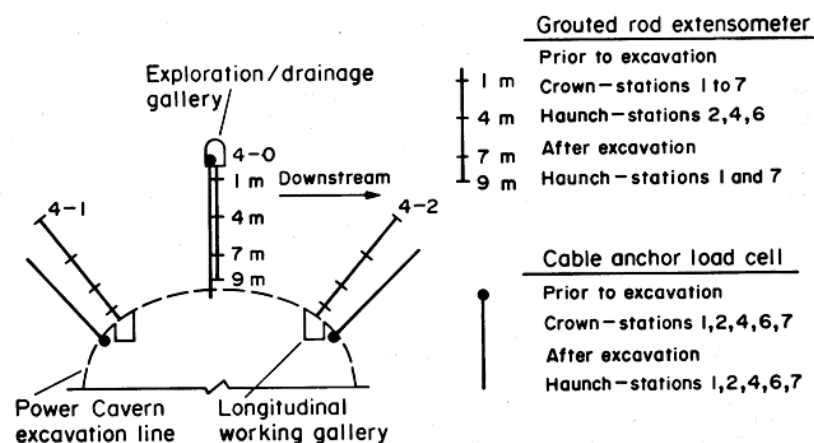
Typical instrumentation array installed in the cavern roof before excavation of the cavern commenced.
